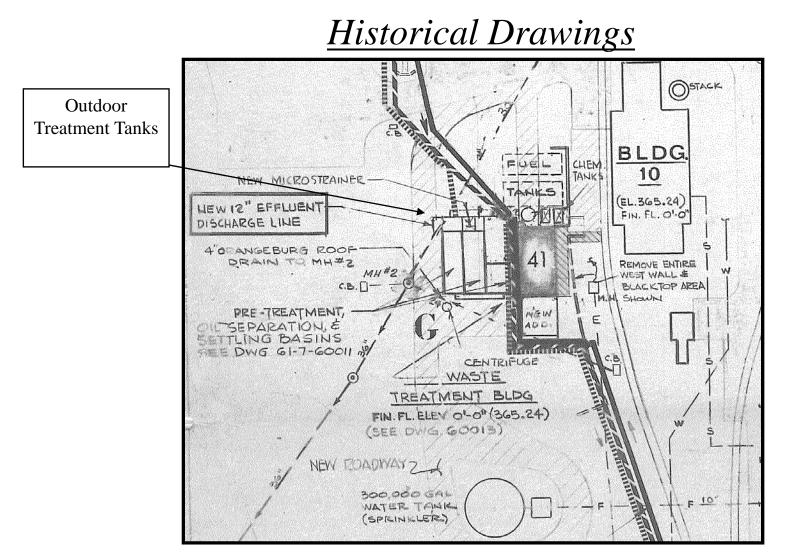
December 5, 1967 AMF drawing No. 61-7-60000 (Proposed New Waste Treatment Building 41 - east orientation). Note location of original Building 41 structure and outdoor treatment tanks. Sumps located on the northeast and northwest corners of the building connected to piping from Building 2 & 4 wastewater tanks, respectively. Also note discharge to stormwater manhole from northeast corner of lone settling basin. Obscured note on this drawing indicated that the settling basin measured 54' long by 14' wide; the EQ tank measured 20'L x 12'W; and the sumps each measured 4'x 4'.
